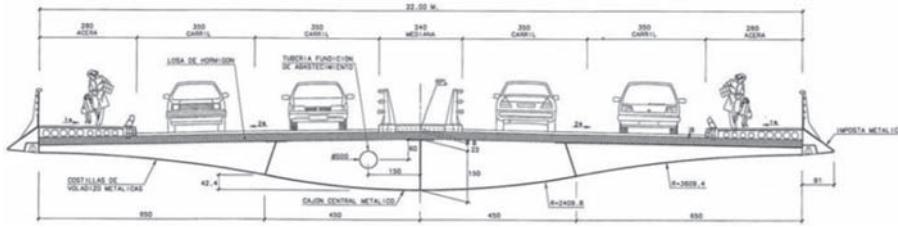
Typical cross section of PCTCAN Bridge (Santander).
